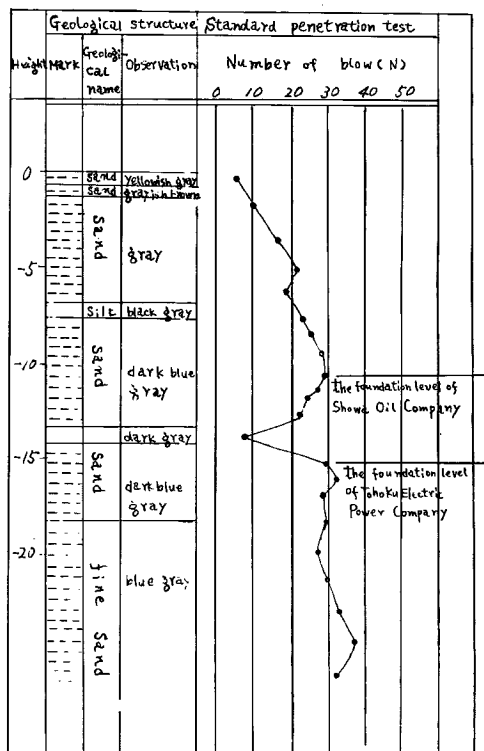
The example of the boring columnar section at Tohoku Electric Power Company's Niigata Steam Power Plant.
